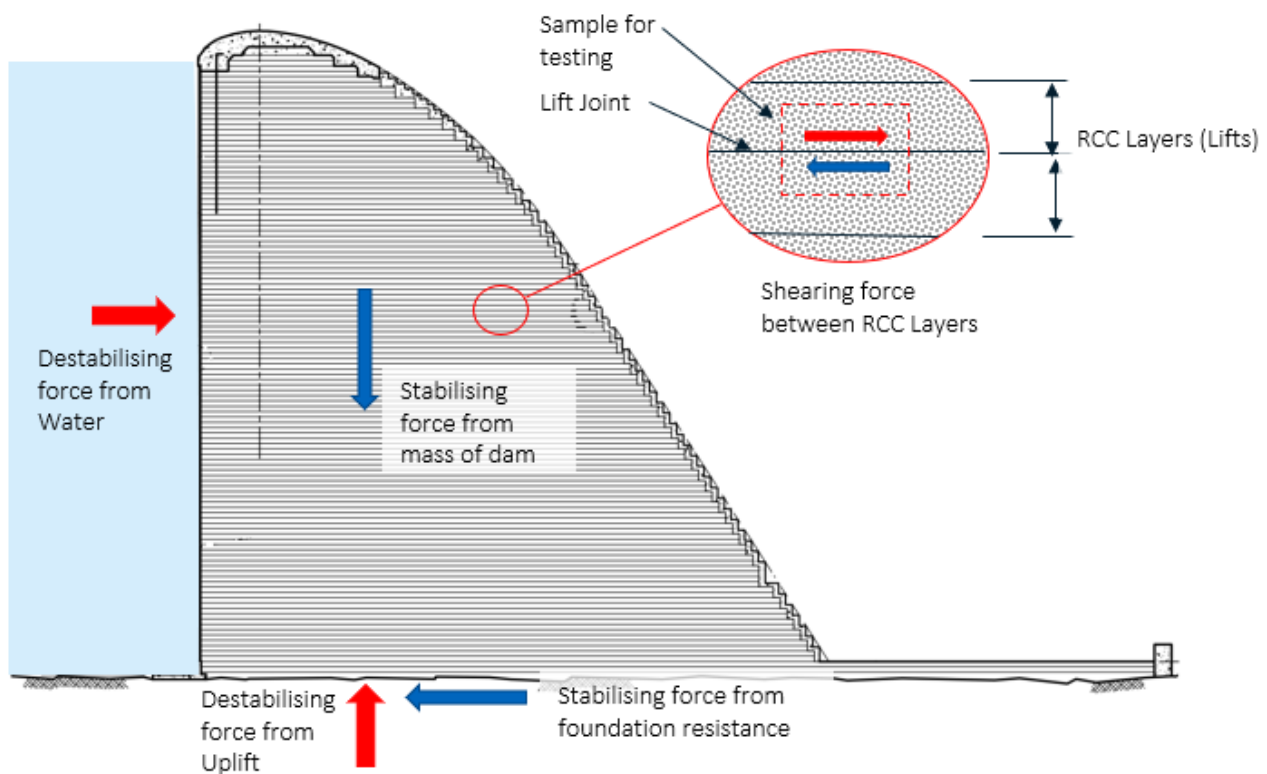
Paradise Dam Spillway Section – demonstration of how forces relate to shear strength of lift joints
